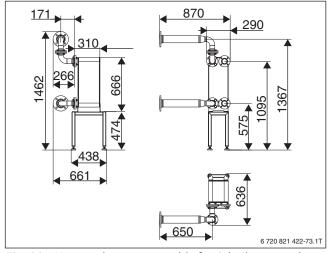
Heat exchanger assembly for 2-boiler cascade 2 × 200 kW
